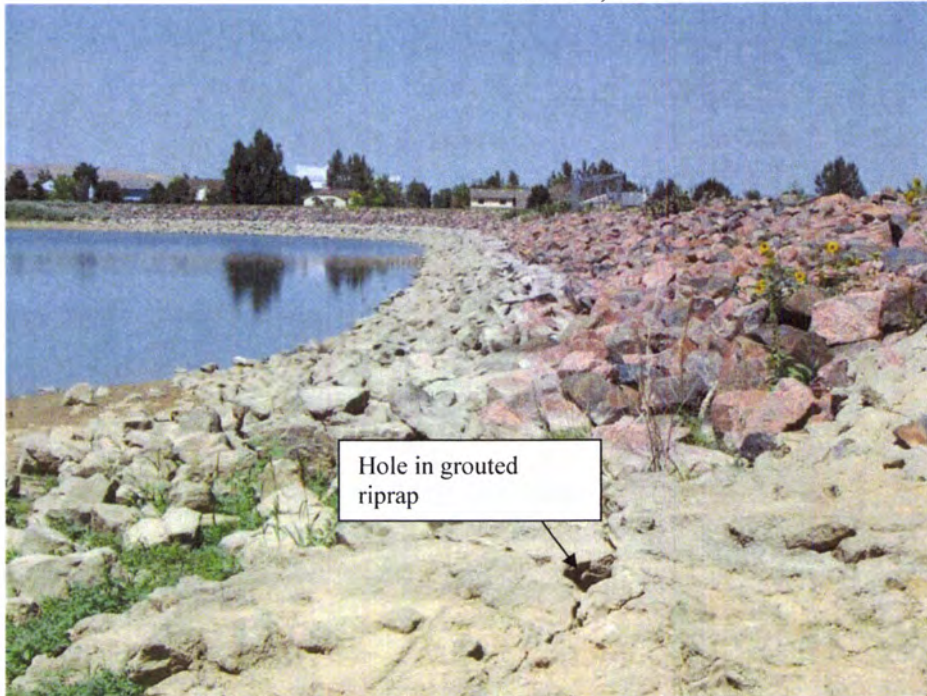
Damaged grouted riprap on the left side of the spillway approach channel.
